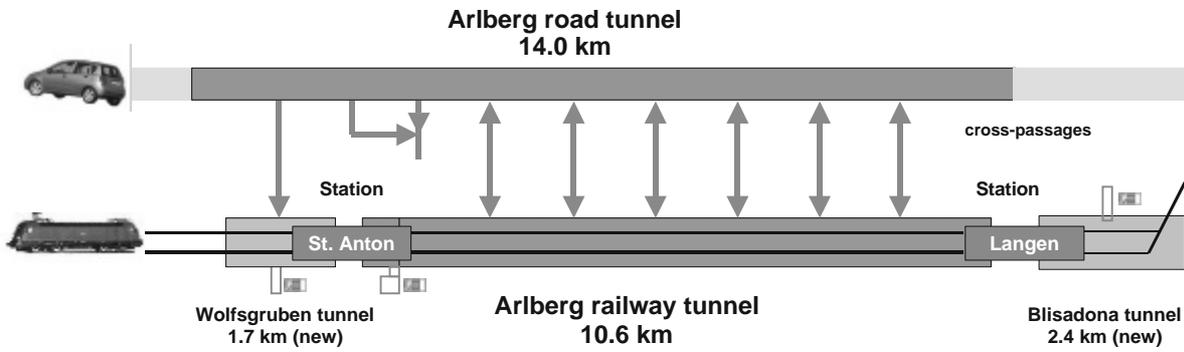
Arlberg tunnel – Cross-passages between road and railway tunnel
